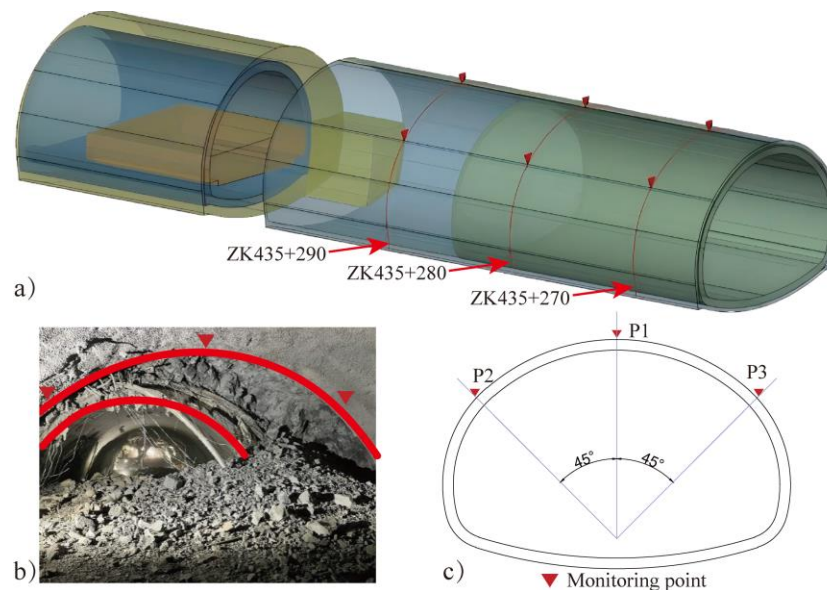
Field monitoring arrangement: a) Longitudinal layout of monitoring sections; b) Expansion excavation; c) Layout of monitoring point
